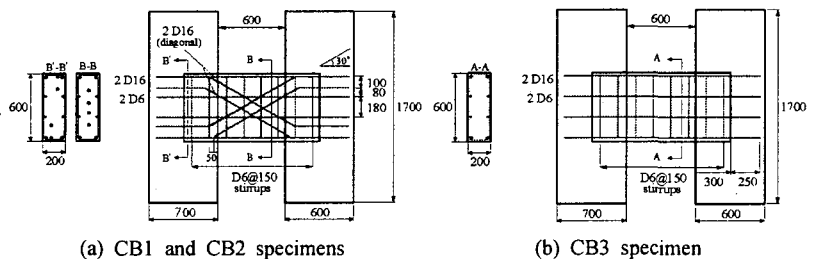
Specimen geometries and reinforcement details (Unit : mm)
